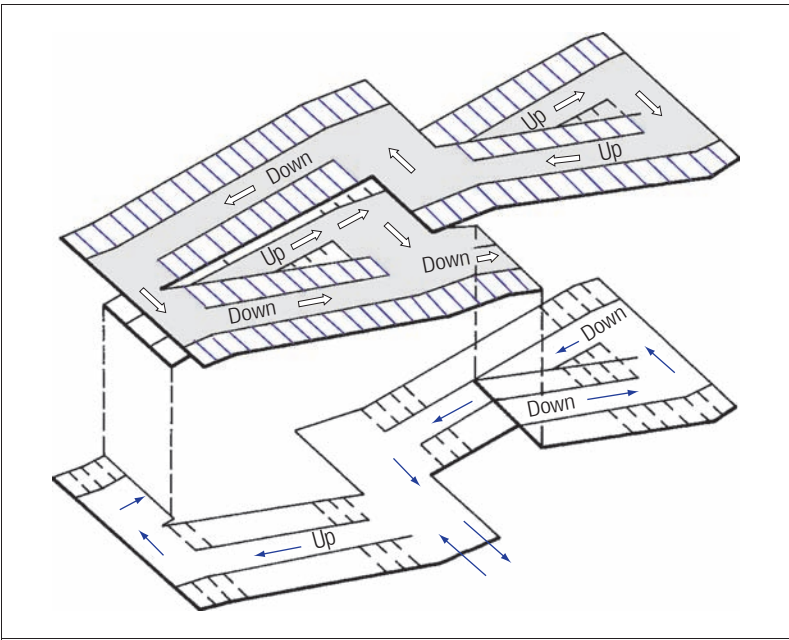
Ramped floor car park with interlaced entry and departure parking ramps
